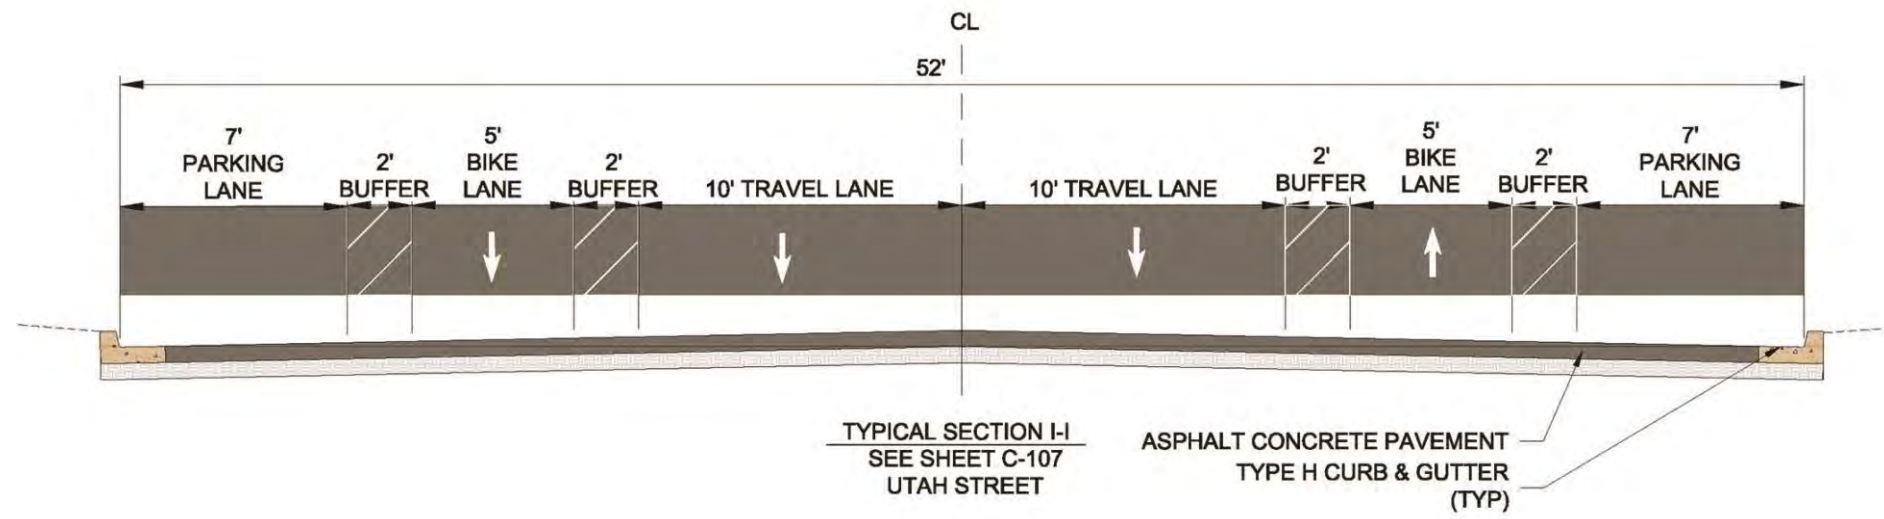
Typical Cross Section on Utah Street between Upas and Landis Streets
